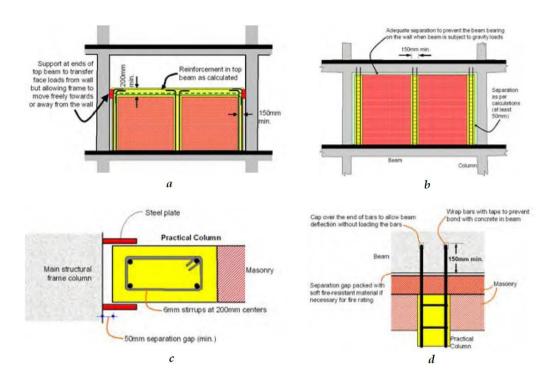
Examples of detailing for masonry infill walls isolated from the main structure (EERI, 2006).
